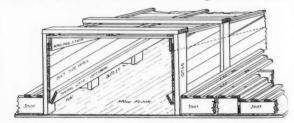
Section of main duct floor of the drier shown in Fig. 3 showing construction details
